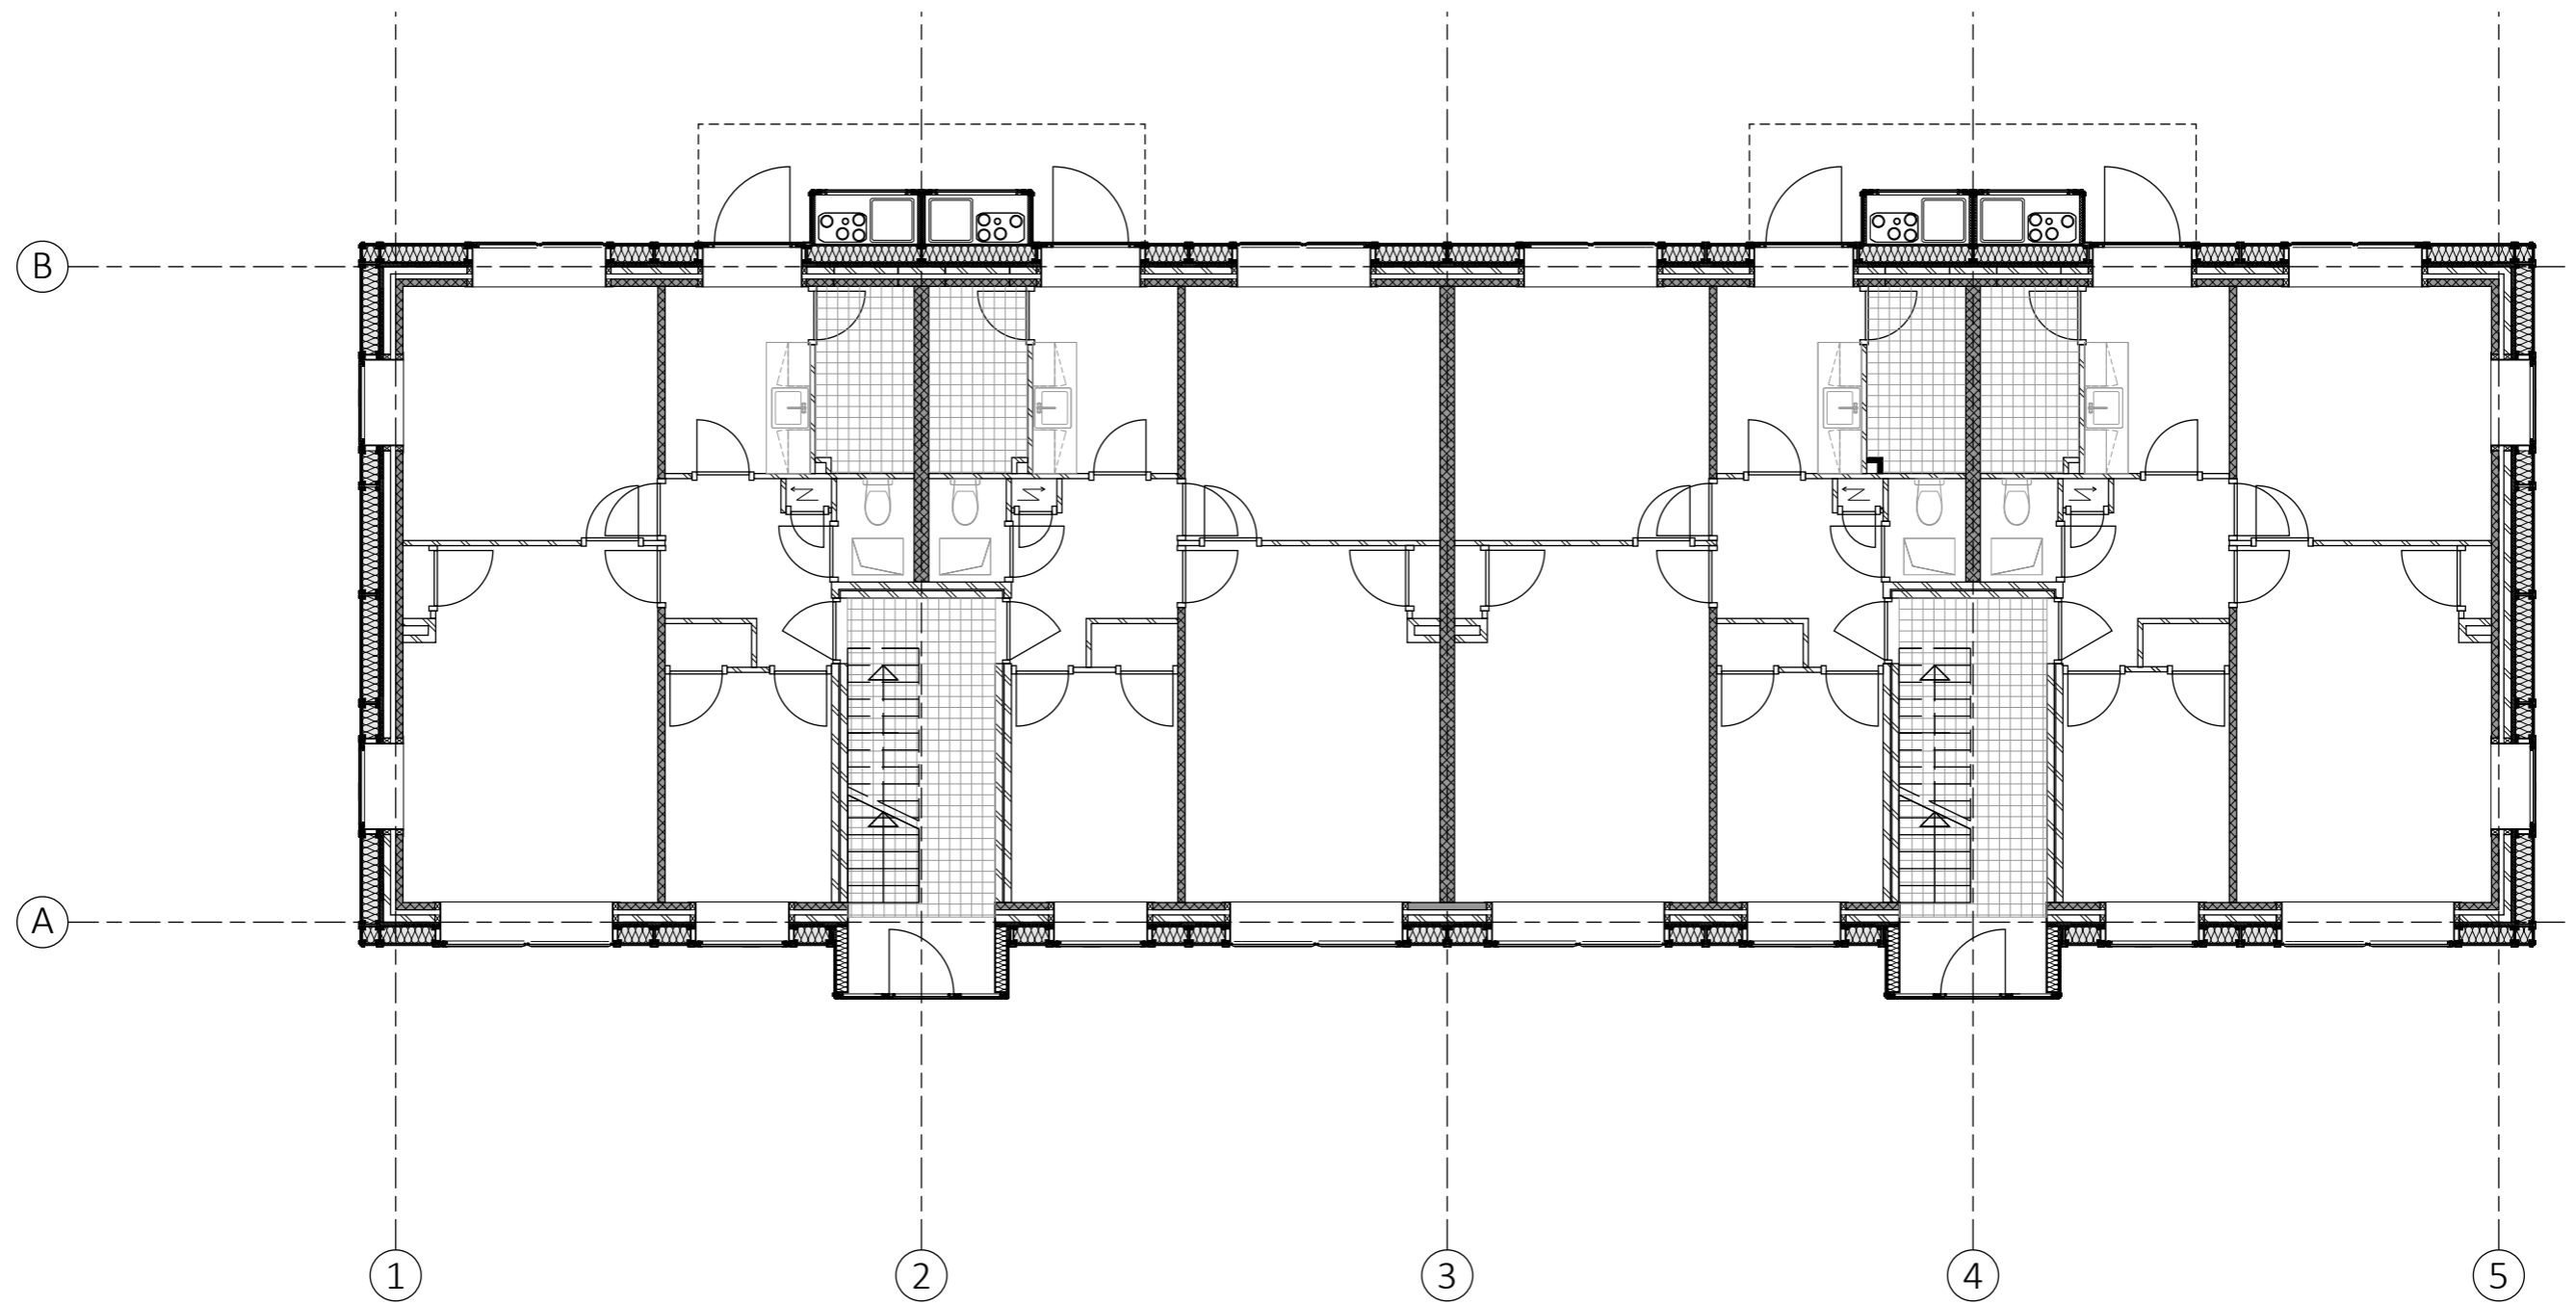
Plan | 1:100 | Ground Floor
